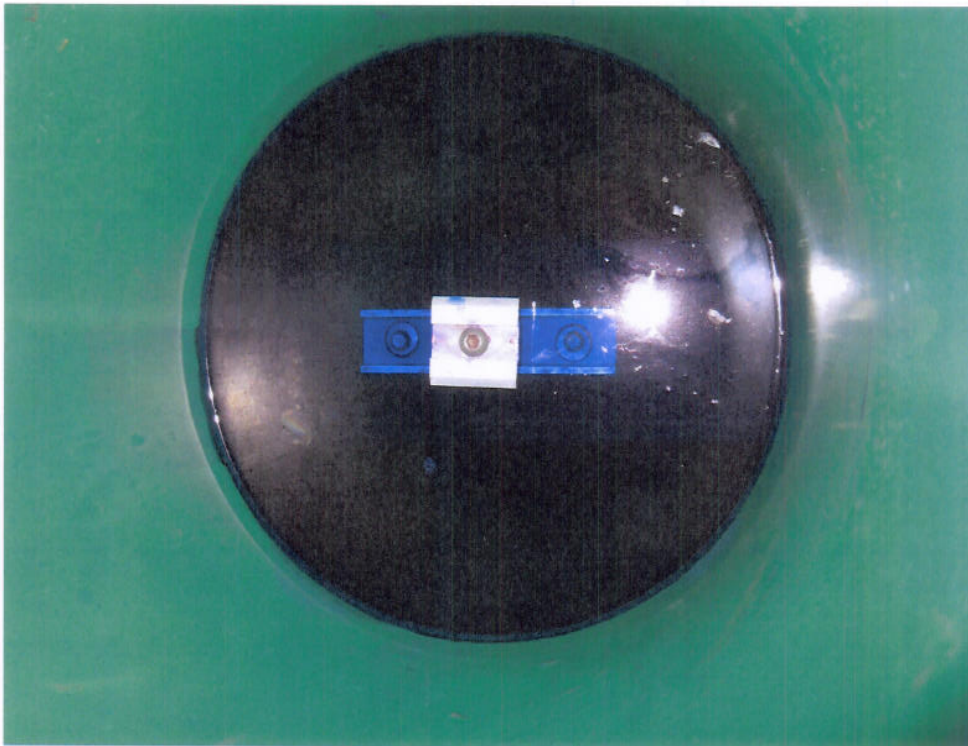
testing waterproofness with a water column as per the upper edge clamp base (water coloured blue for checking purposes)
